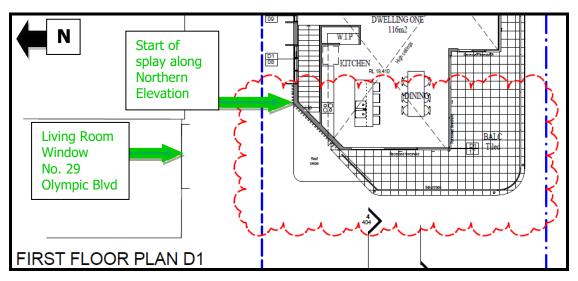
Relationship of the modified first floor plan of Dwelling 1 to the Living room window of No. 29 Olympic Boulevarde.
